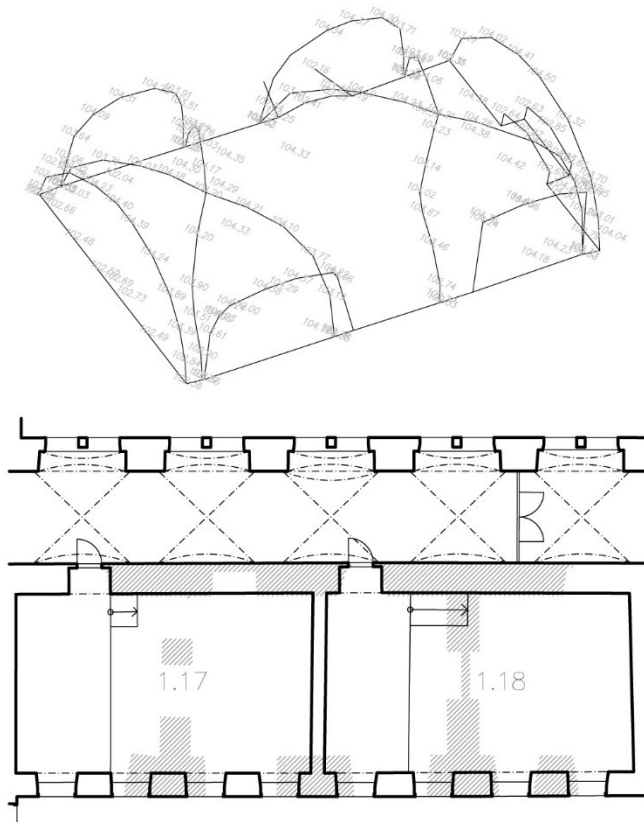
The shape of the vault edges under rooms 1.17 and 1.18 (top), floor plans of the rooms concerned, with the indication of the supporting walls on the floor below. (Source: Zdražil, Buzek, 2021)
